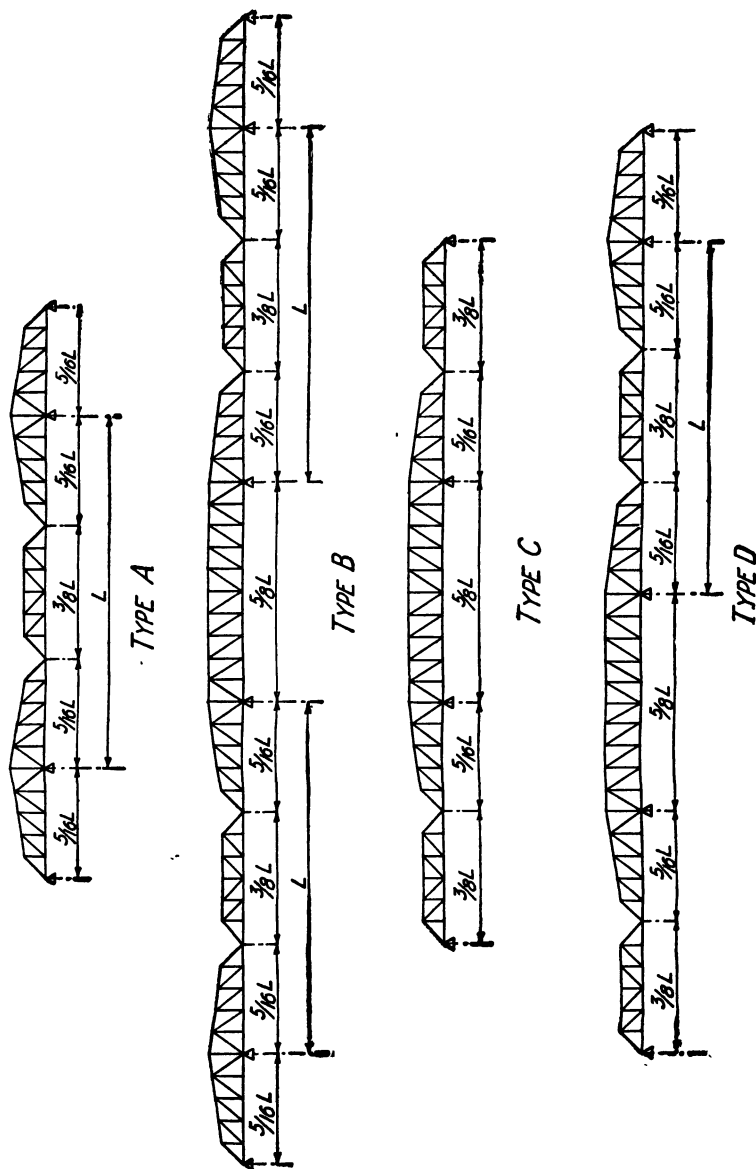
Typical Layouts for Double-Track-Railway, Cantilever Bridges.
